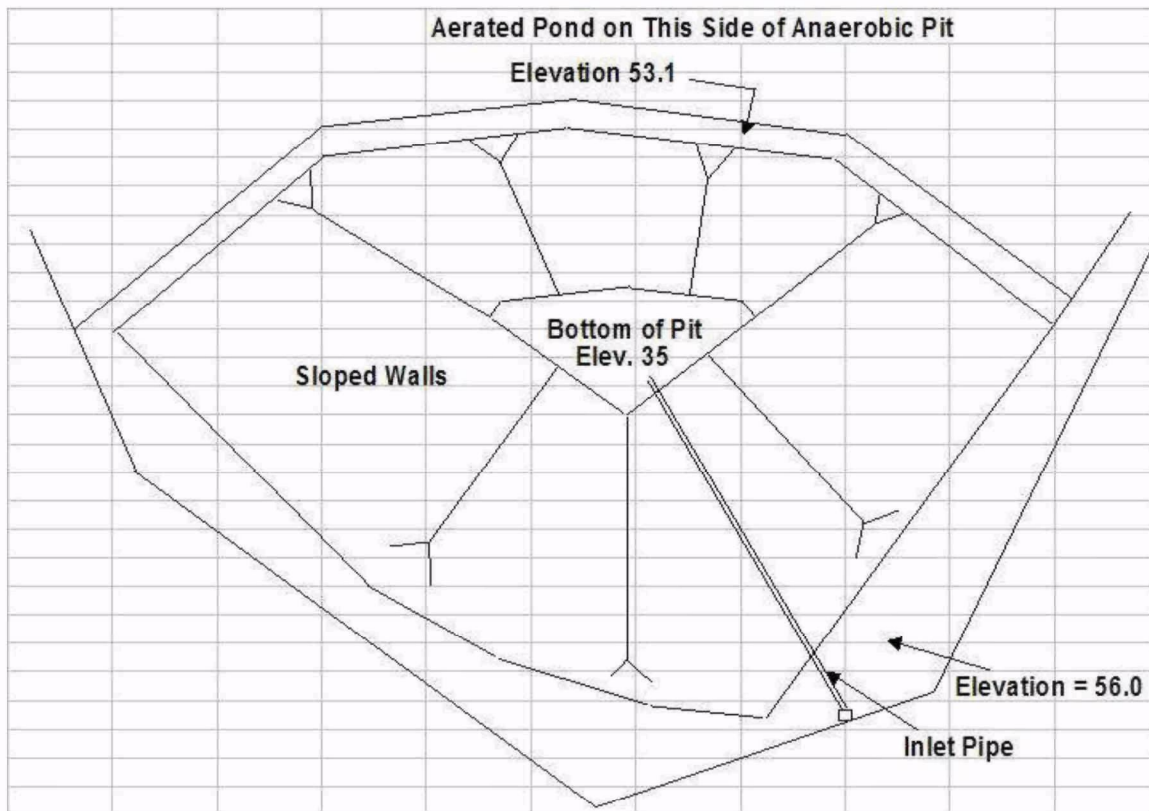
Plan view of Dove Creek Fermentation Pit (Fagan, pers. comm.).
